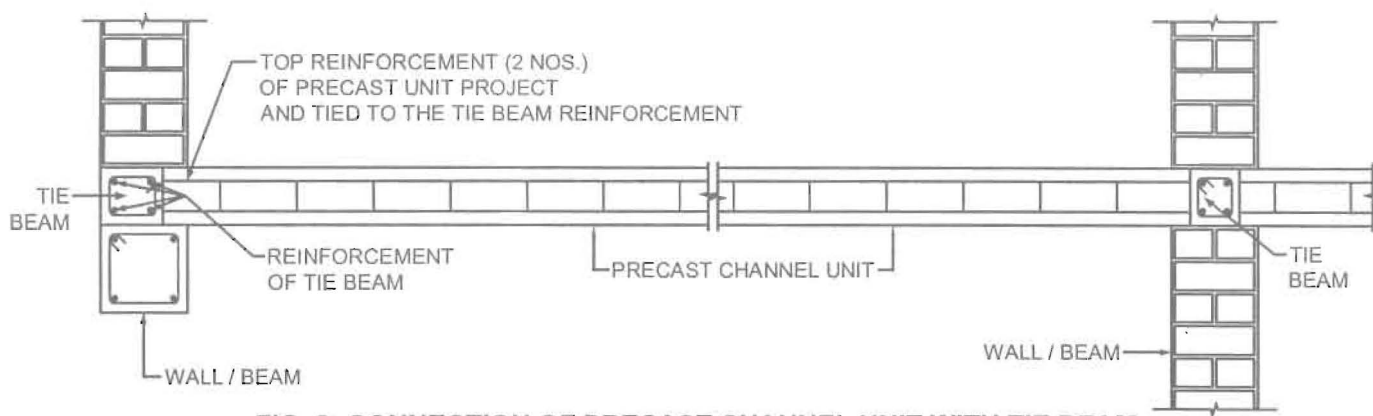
CONNECTION OF PRECAST CHANNEL UNIT WITH TIE BEAM
